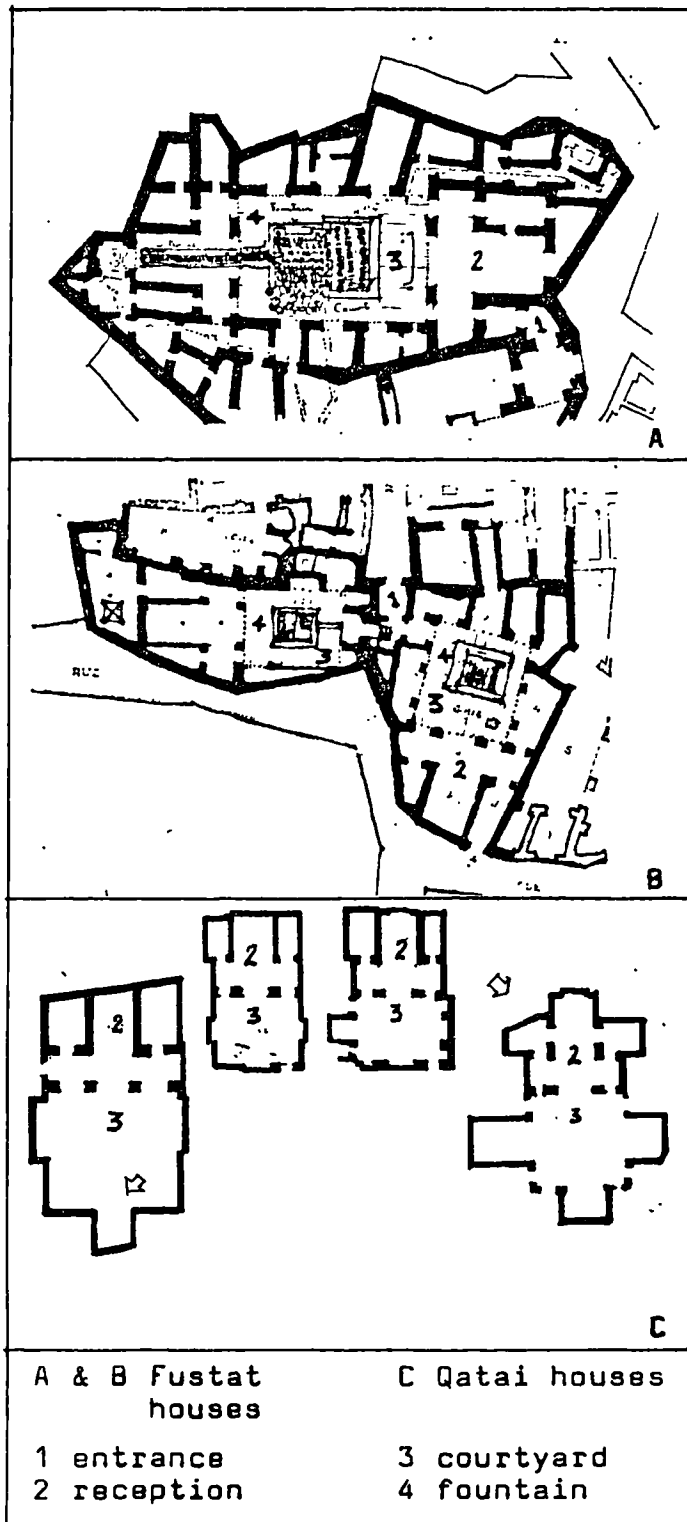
House plans discovered at Fustat and Qatai archeological sites (231). The house is generally divided into two sections, reception and private. All spaces are inward-looking onto the thermally controlled court.
